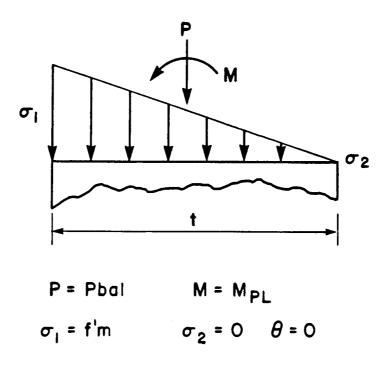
Internal Stress Distribution on a Wall Cross-Section Having a Balanced Failure (Ferguson, 1979)
